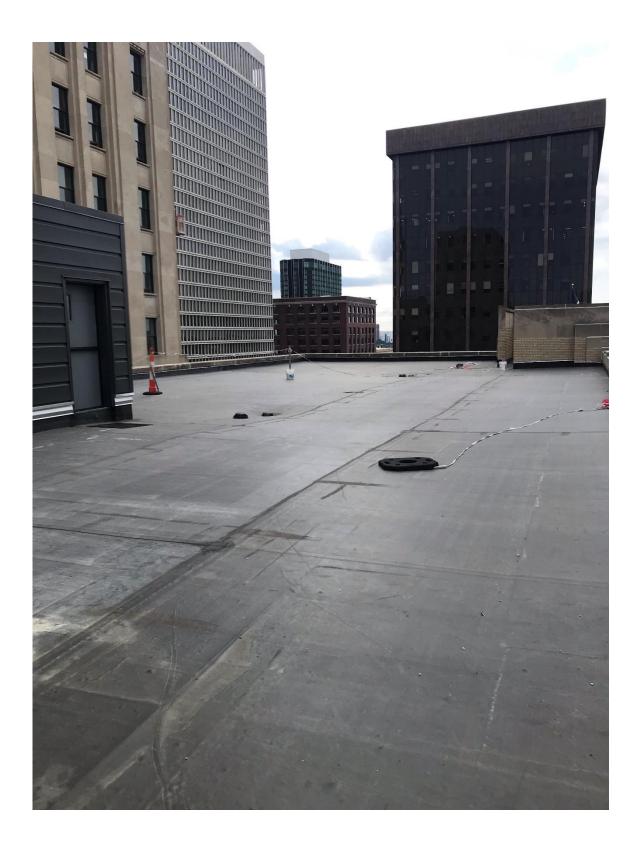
Exterior, West Roof, Looking South. 7/31/19
